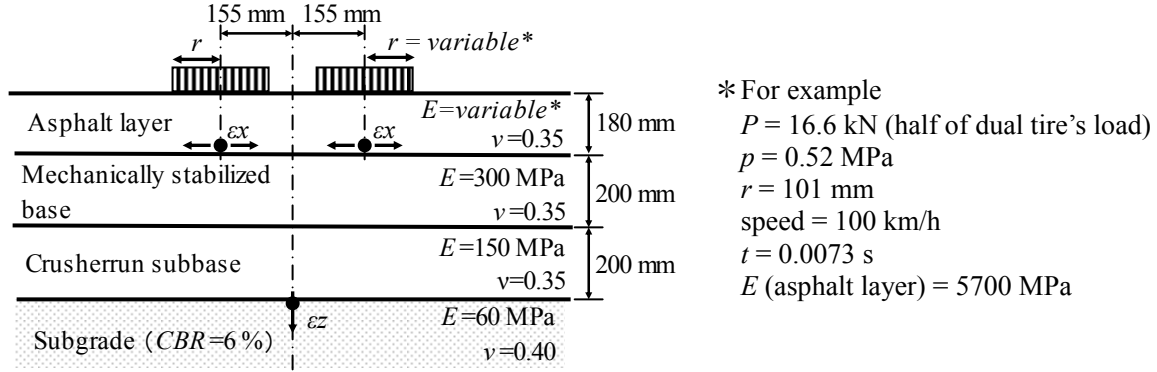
Pavement model with wheel load of dual tire for damage analysis.
